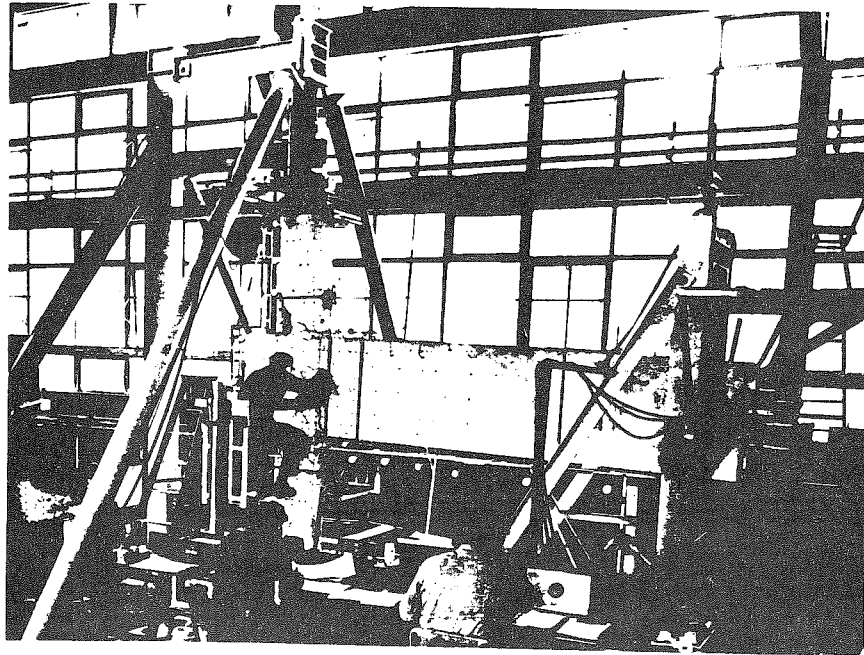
Precast Post-Tensioned Prestressed Concrete Beam-Column Frame Subassembly Under Test [10].
